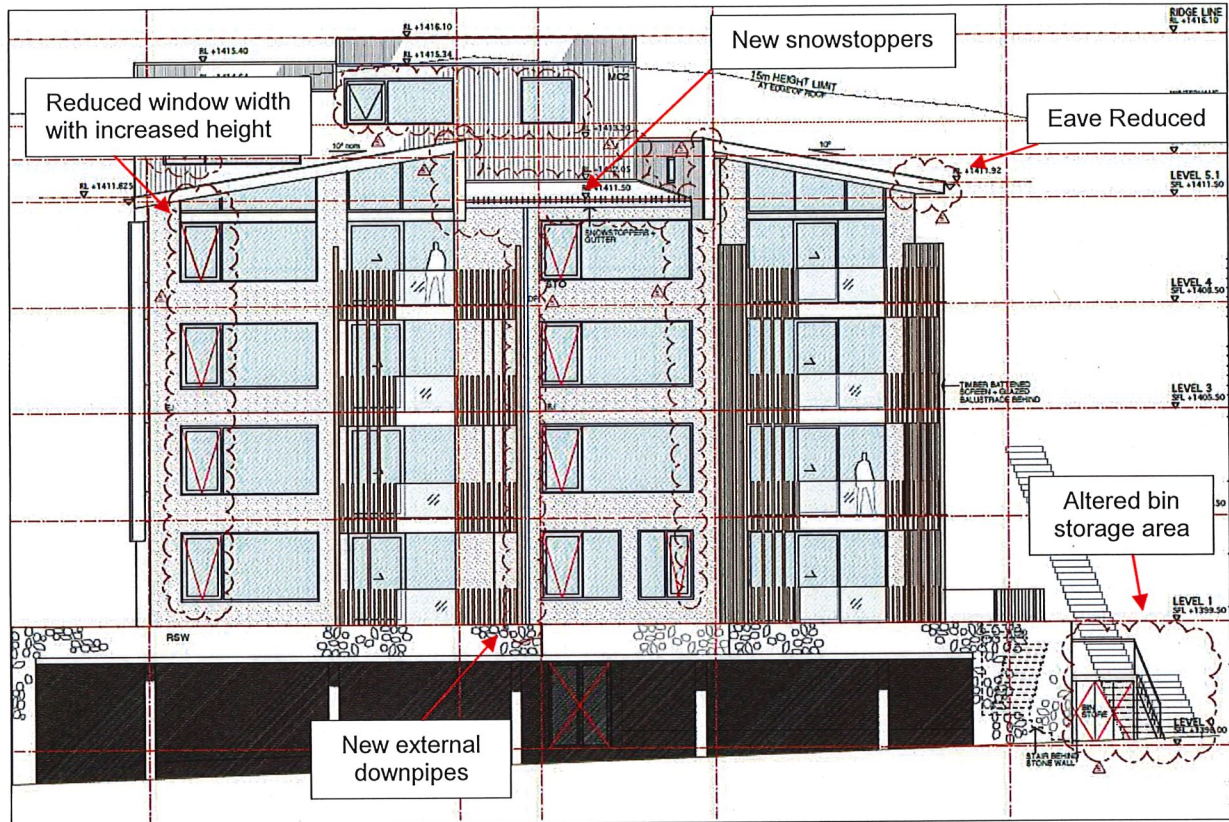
Proposed amendments to north-west elevation (Source: Applicant's documentation)
